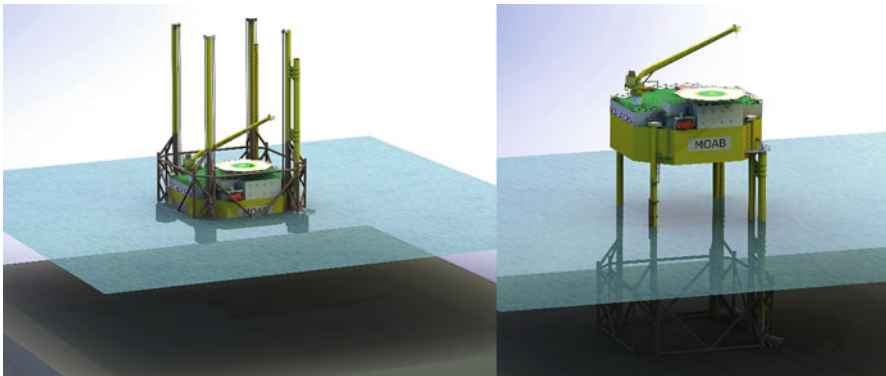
Self-elevating installation. (Source: Overdick GmbH & Co. KG)
